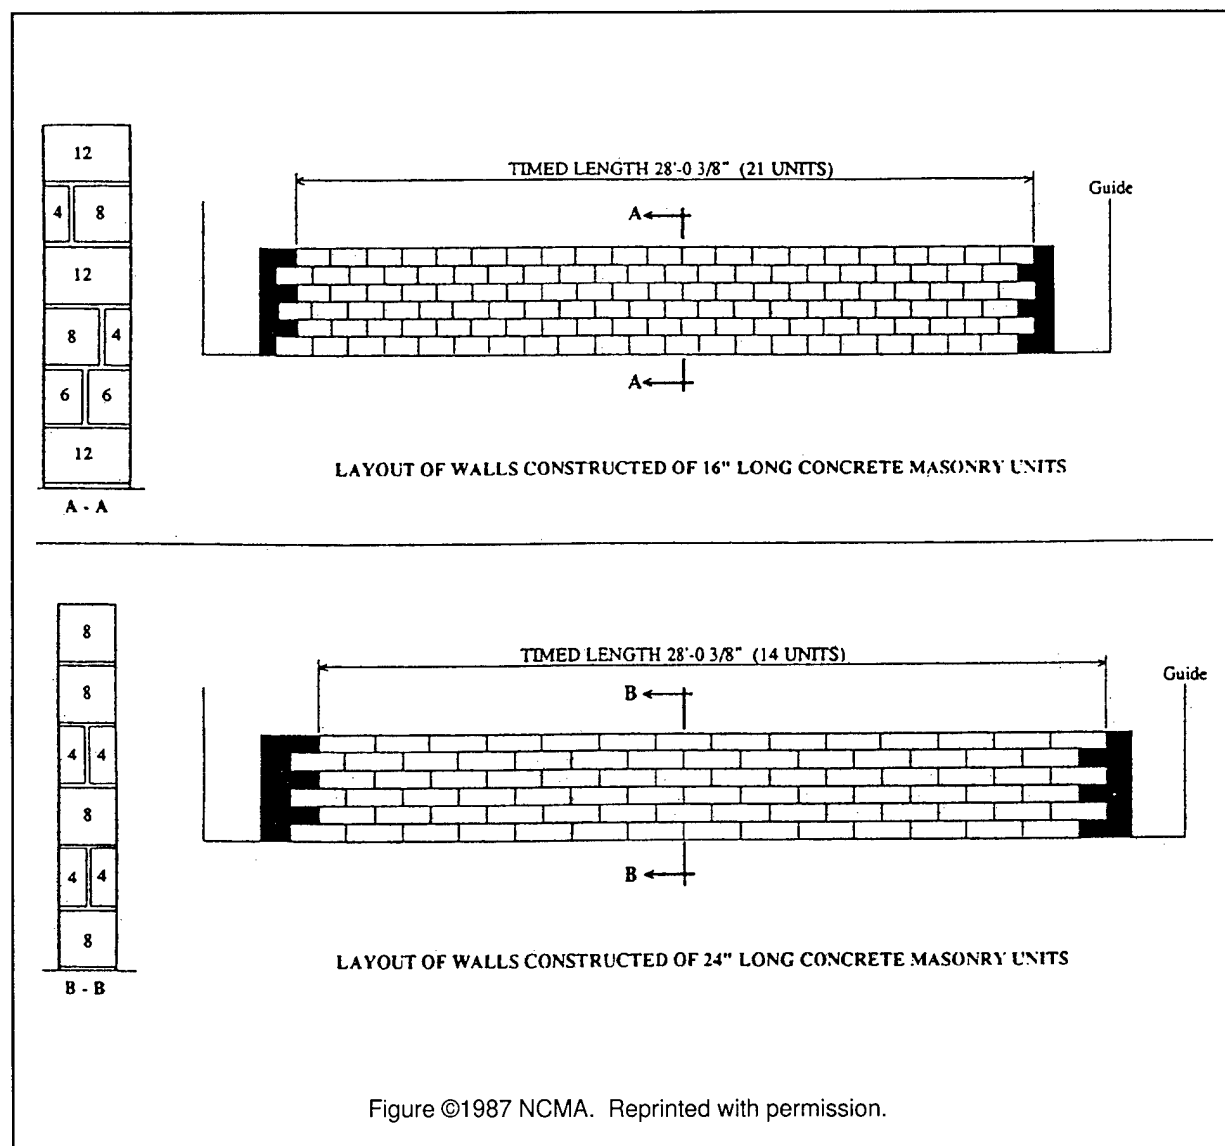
Layout of walls constructed of 24-in. long concrete masonry units.
